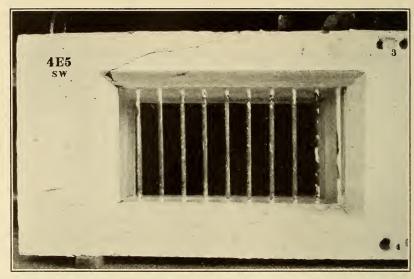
Failure of beam 4E5 with vertical bars, and no concrete, in web
